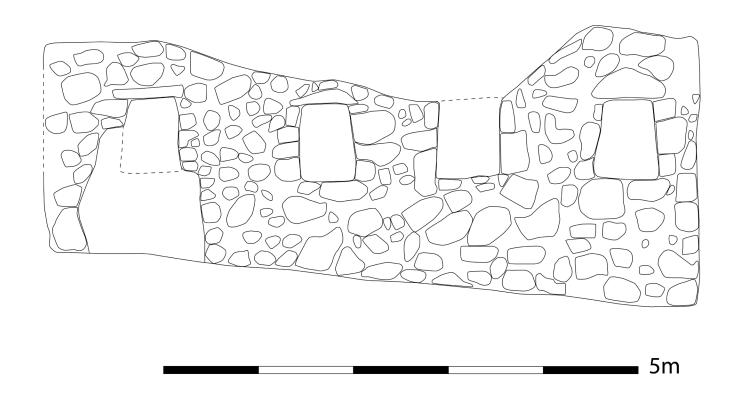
Inside elevation of the West wall of Building NC7, Kañaraqay
